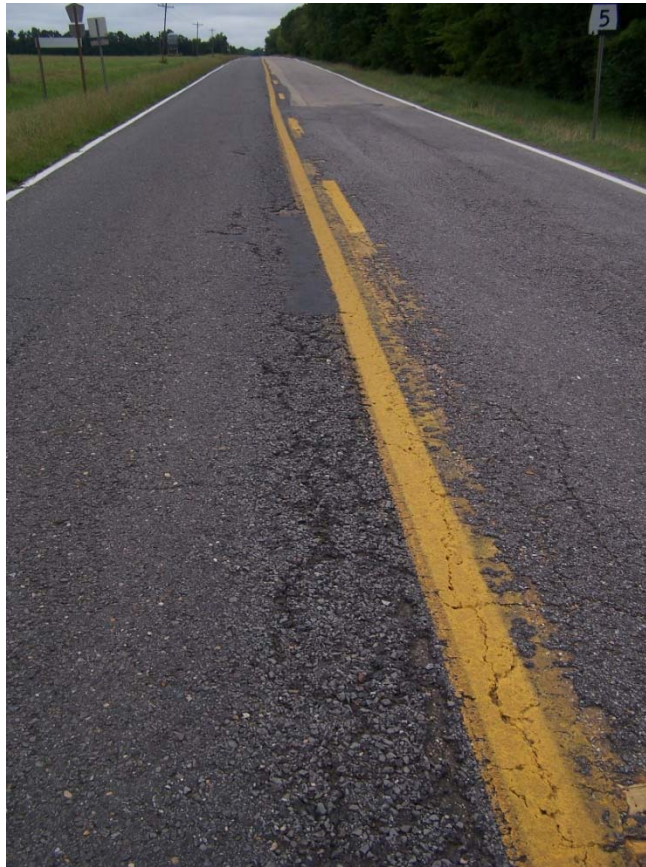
AL5 Facing South MP 51.81 (Photo Taken 11/18/13)
